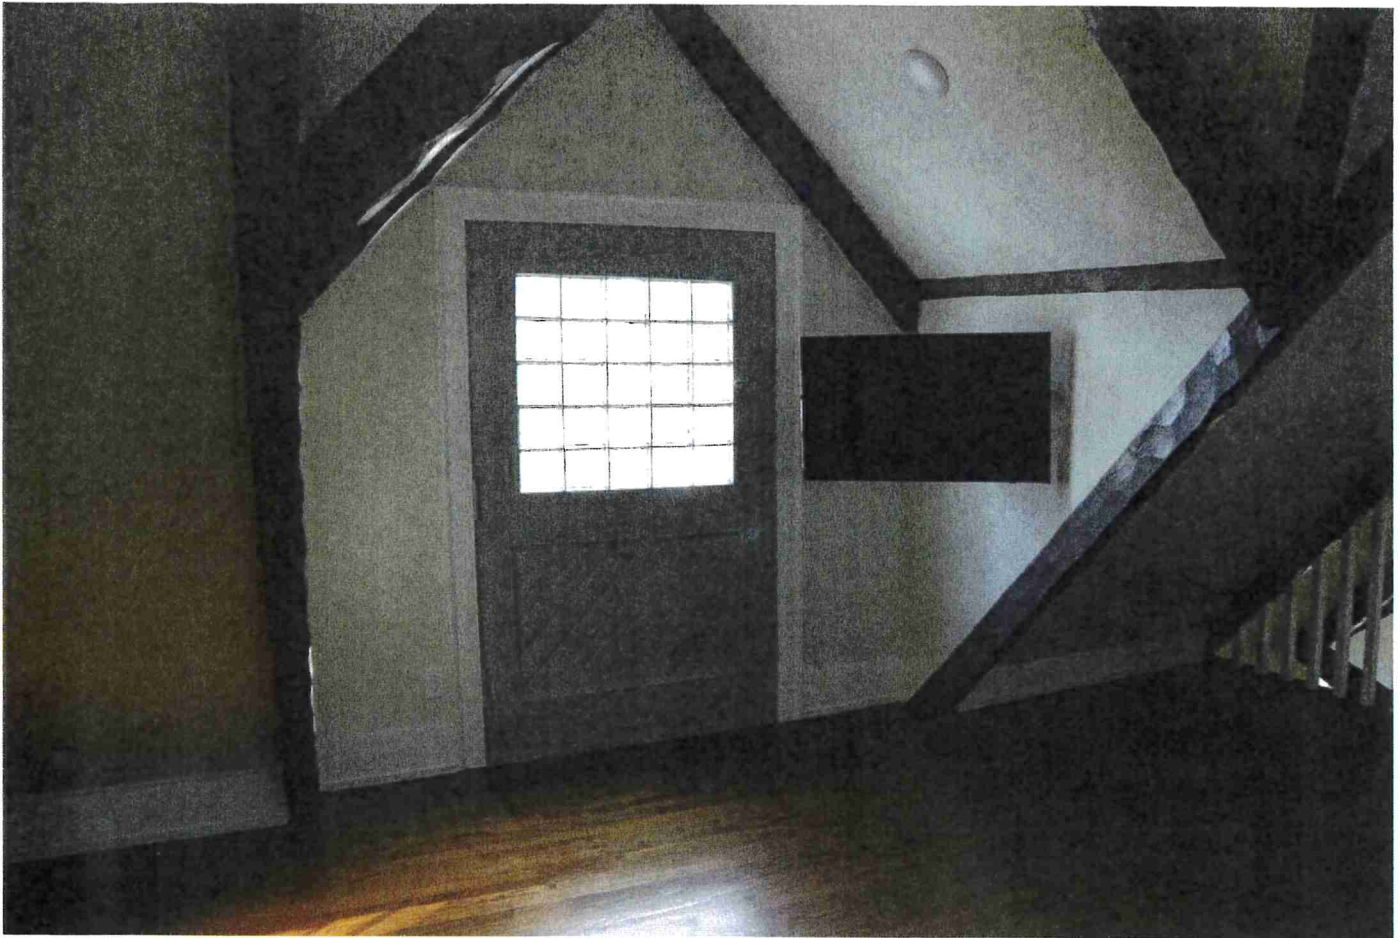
Restored loft and original hayloft door on second-floor. 10/28/16
